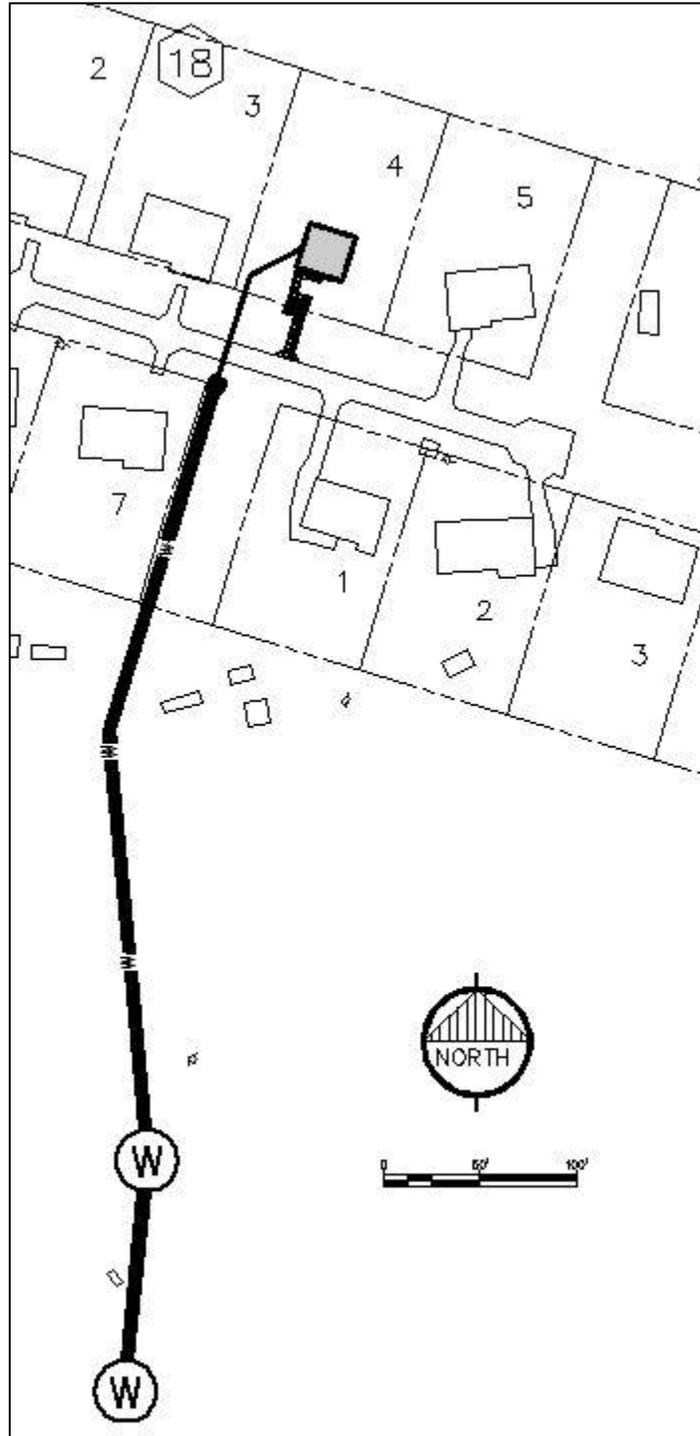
below shows the site plan of proposed Pump House 2 with the connecting utilidor, junction boxes, water transmission line, and well field.
